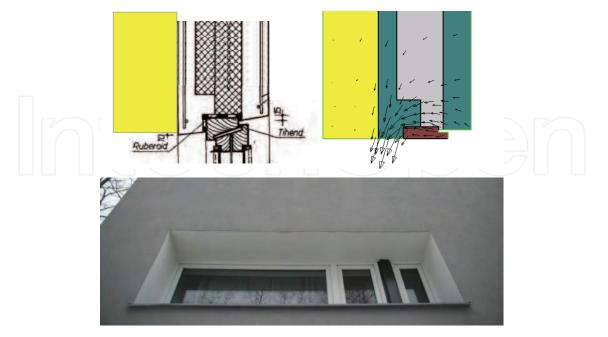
Thermal bridge in connection of window and insulated external wall (up). Window in insulated wall (down)
